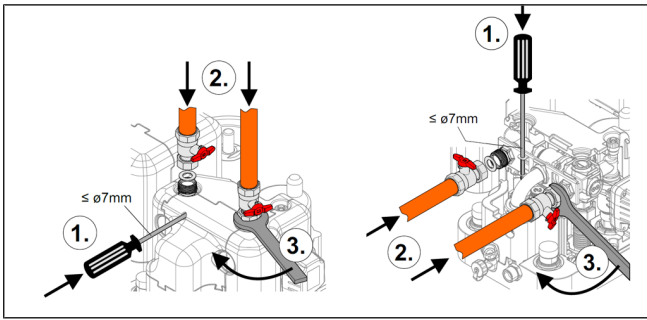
Fix the hydraulic block in place when connecting to the top (left) or to the rear (right)
